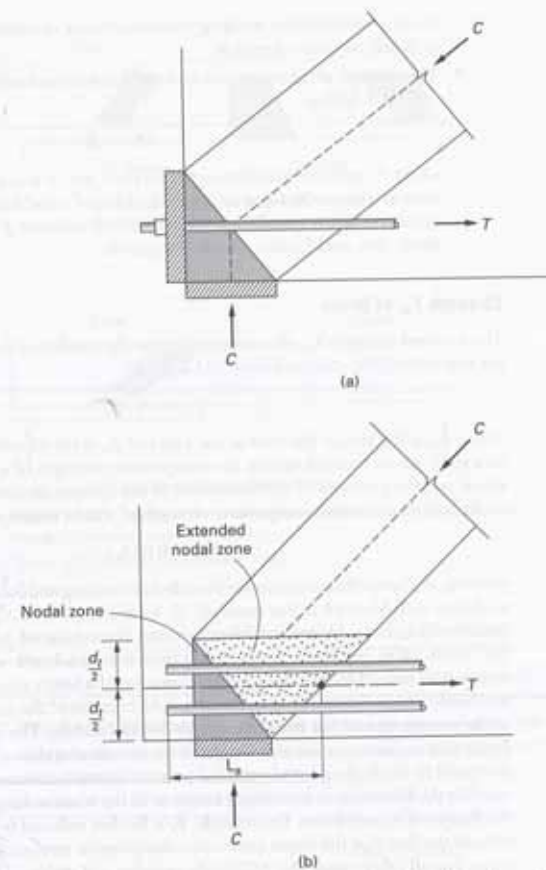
Anchorage of tie reinforcement: (a) anchored by a plate; (b) anchored by bond.
